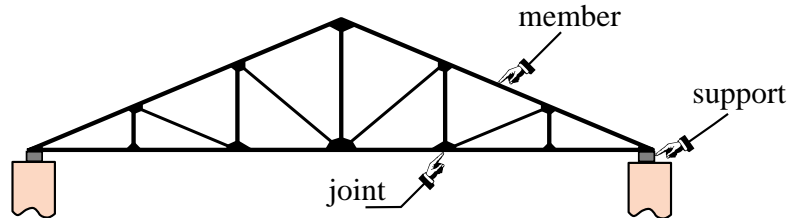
An actual plane truss structure. That shown is typical of a roof truss used in residential building construction.
